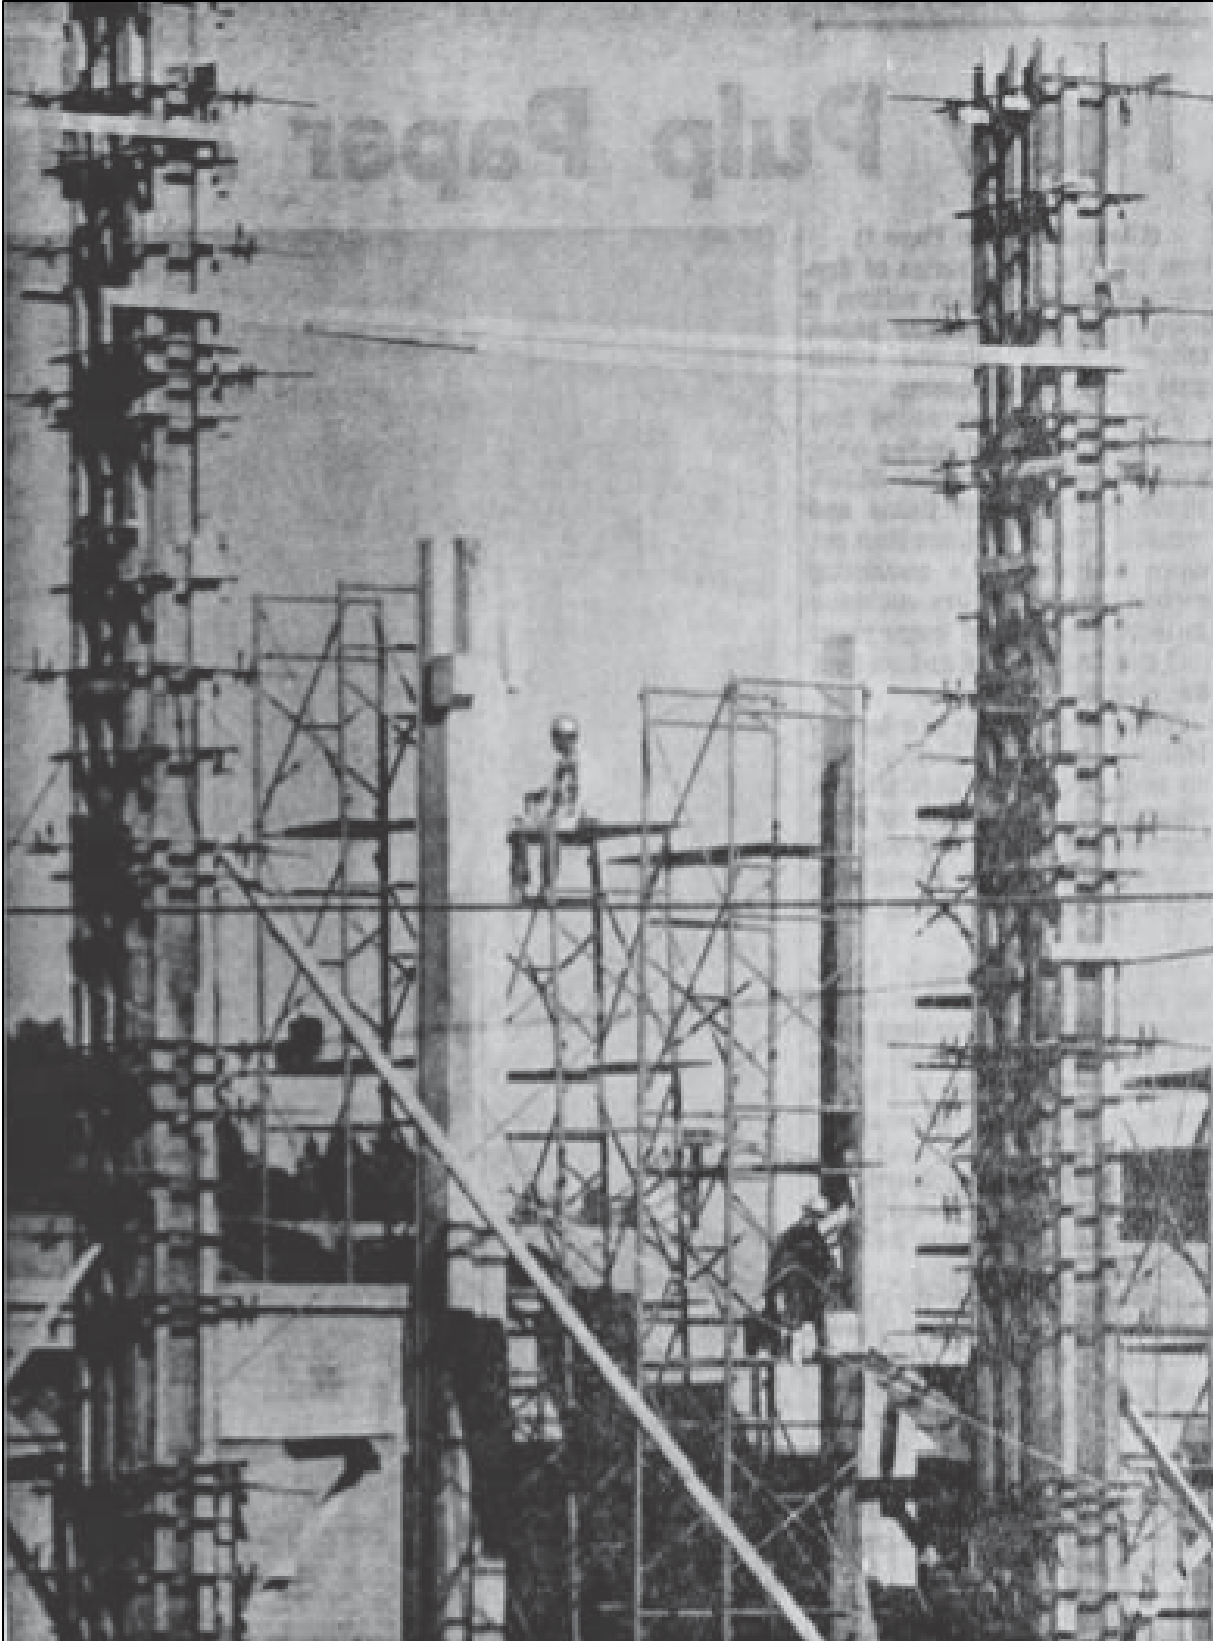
1964 photo of Building 3 during construction showing south warehouse columns (ADS November 9, 1964).).
